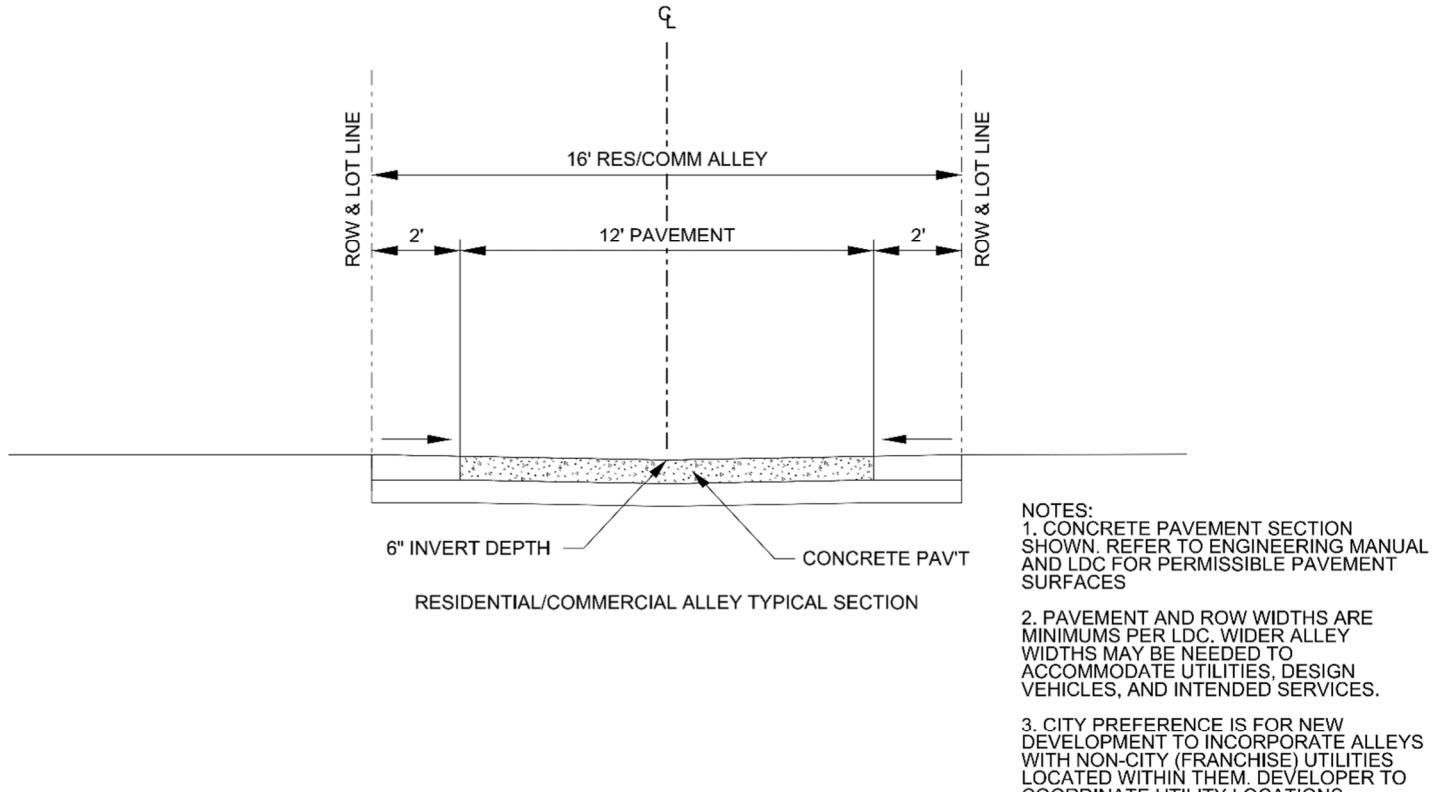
(b) ALLEY TYPICAL SECTIONS
